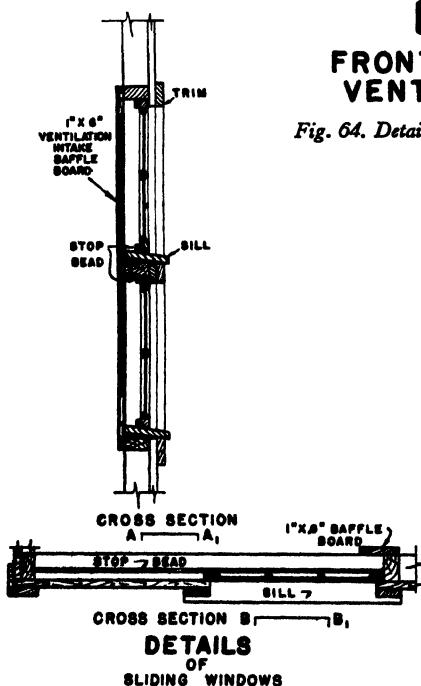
Details of the sliding windows and the ventilation intake baffle board.
